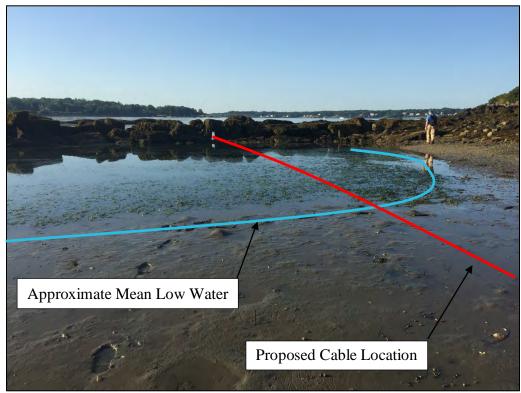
House Island view southeast along proposed cable route. Cable will be buried to MLW (shown here) then laid along sediment surface. The cable will exit the breakwater at manmade passage.
